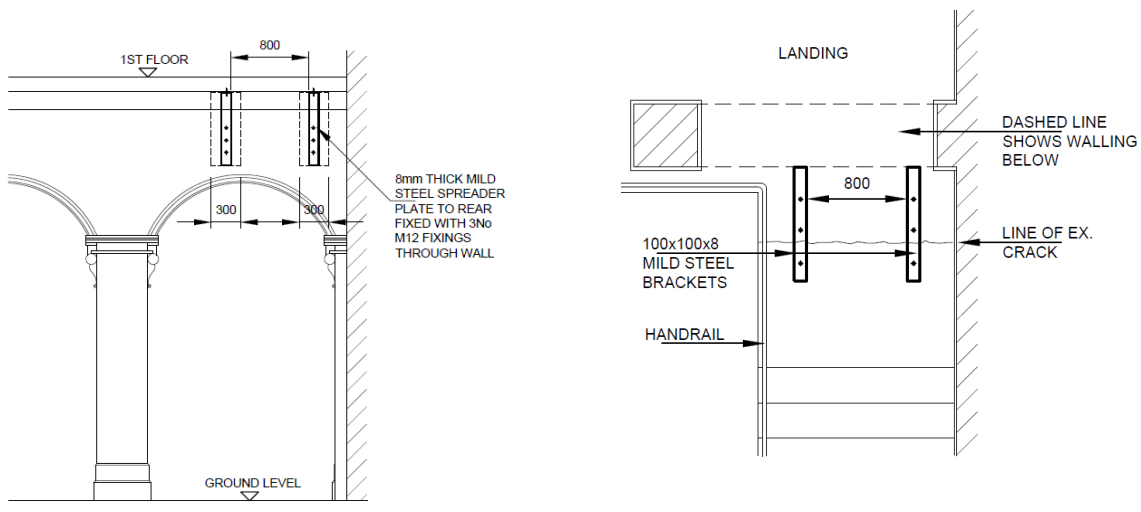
Proposed elevation on arched opening at the ground floor landing to the 'Back Staircase'.
